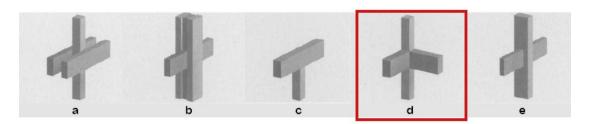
Five Forms of frame construction (Pics from Systems in Timber Engineering)
